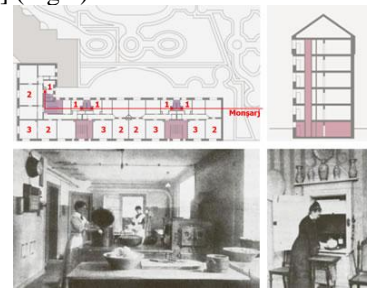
Otto Fick's Service House Project plan, section, central kitchen and mon-charge detail
